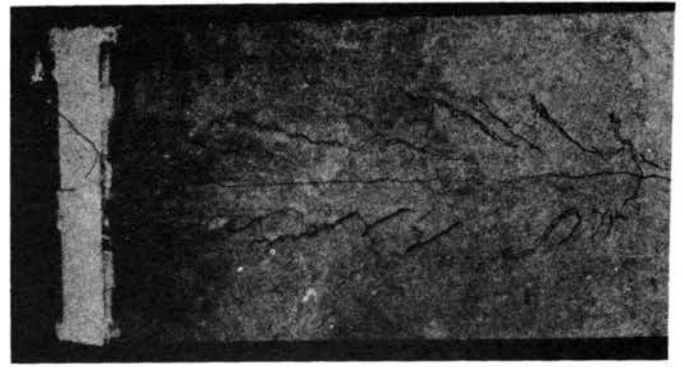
Top view of slab in Beam 41a, showing the herringbone cracking in the concrete. Such cracking did not prevent the beam from surpassing its calculated capacity.
